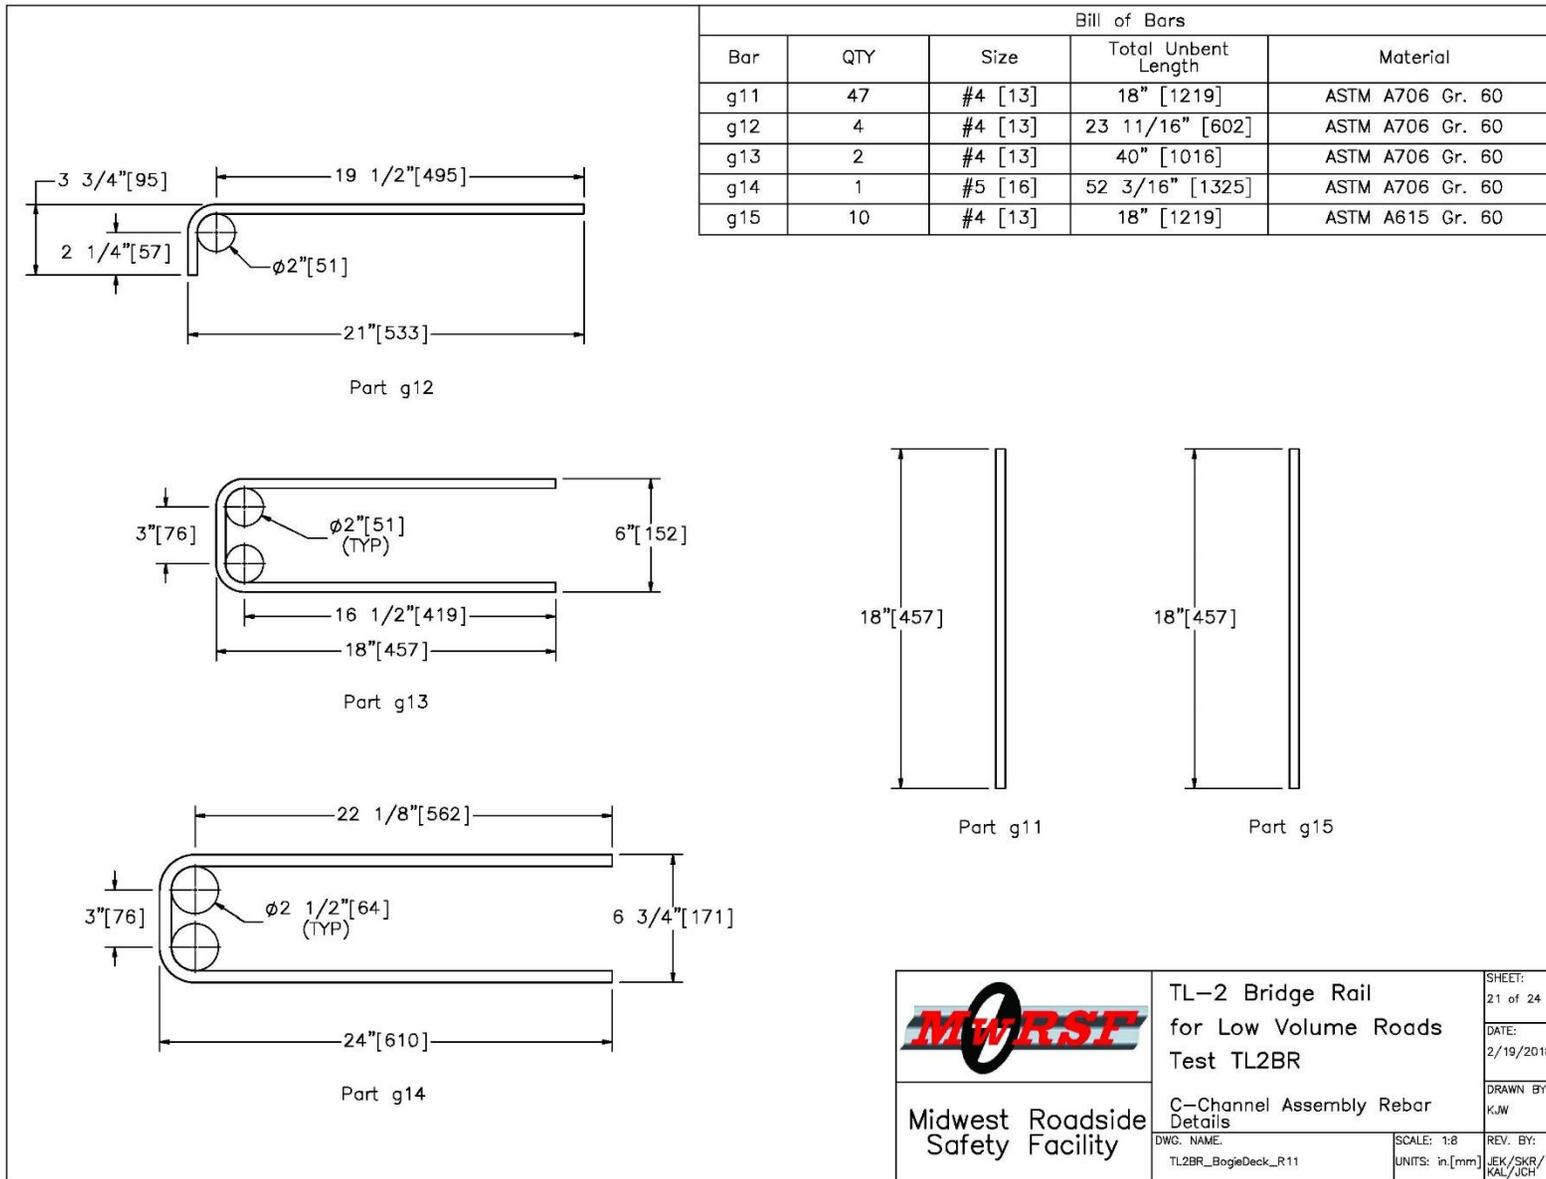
Bogie Testing Matrix and Setup, C-Channel Assembly Rebar Details
